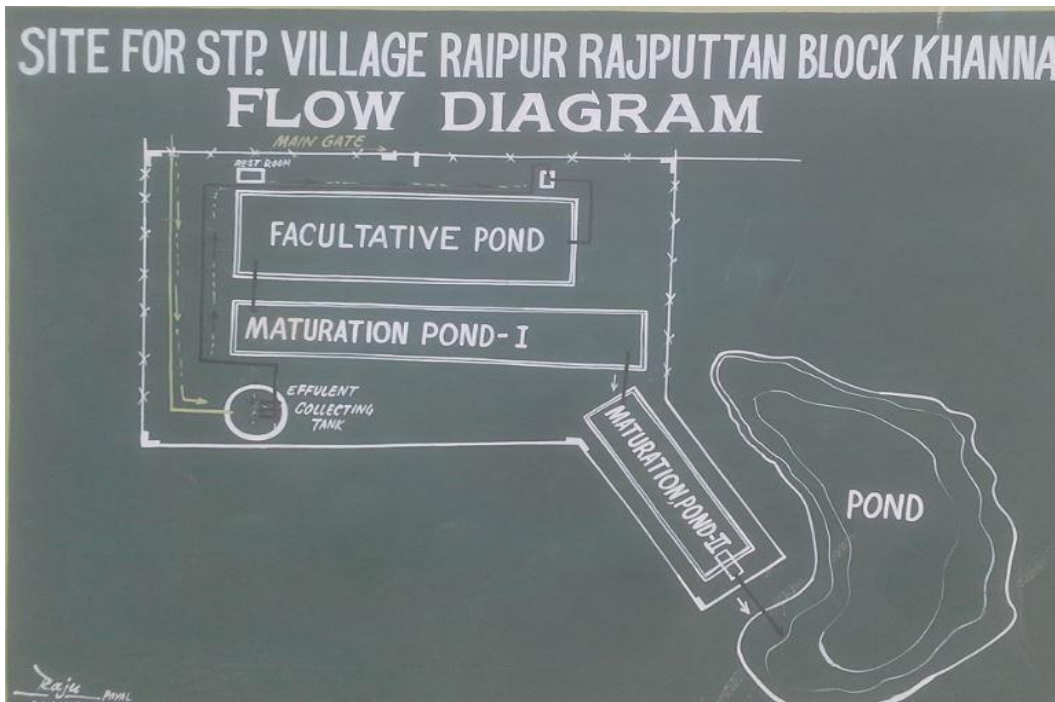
Site layout of DWSS STP Raipur Rajputtan
